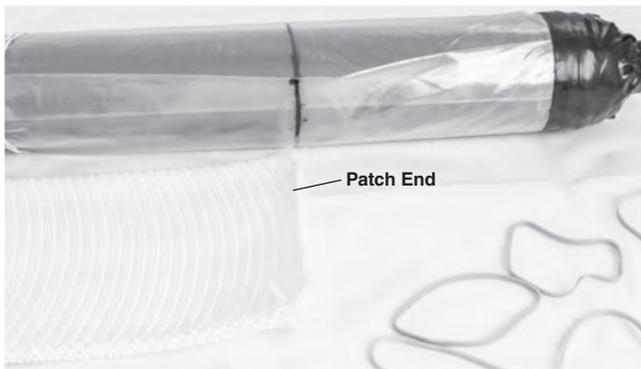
B – Marking Encroachment Zone/Patch Ends On Packer Sleeve
